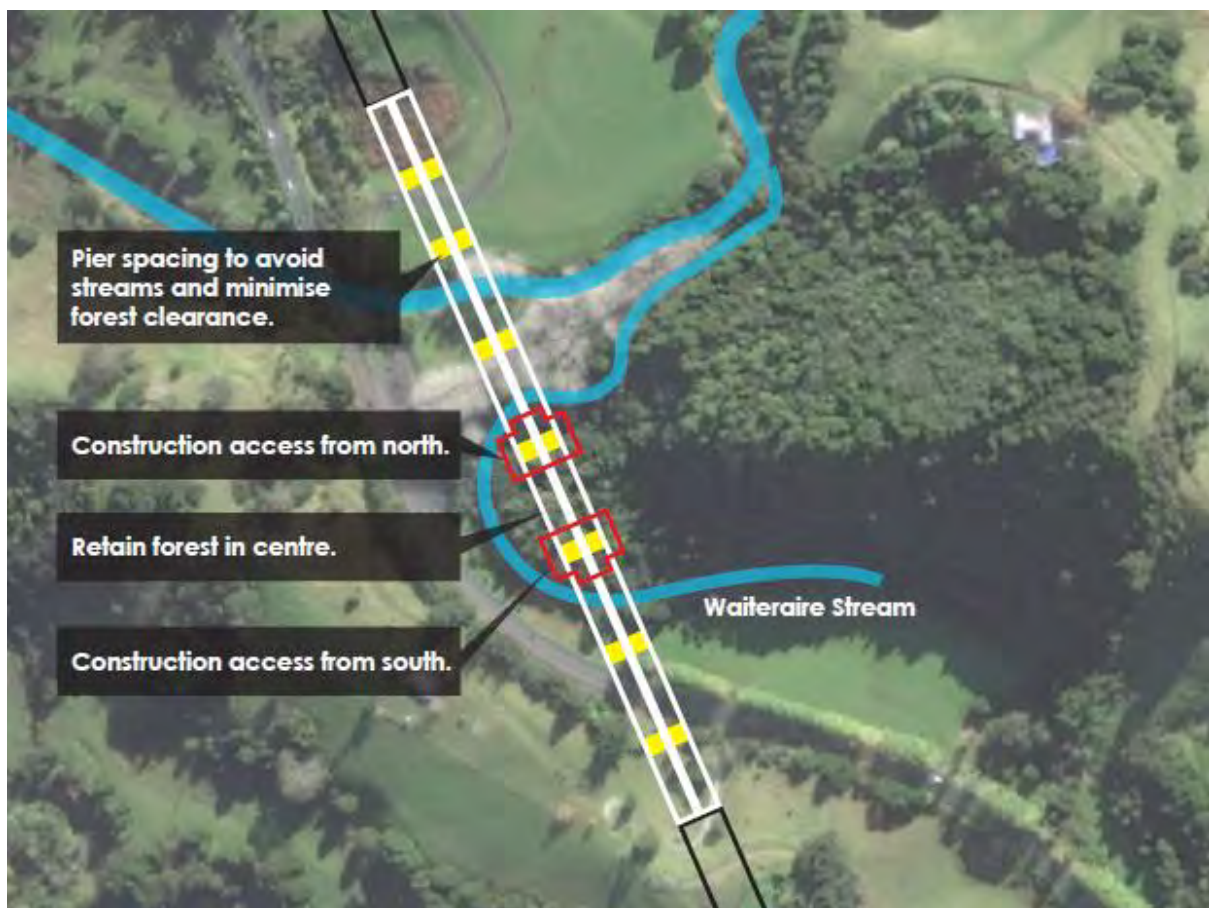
Proposed positioning of Bridge 11 piers within SEA
